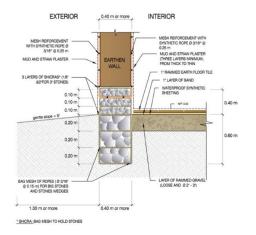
Innovative Foundation System and Wall Reinforcement for Earthen Buildings. Seismic isolation and drainage function. Synthetic mesh to avoid partial collapse. (Credits: Authors).
